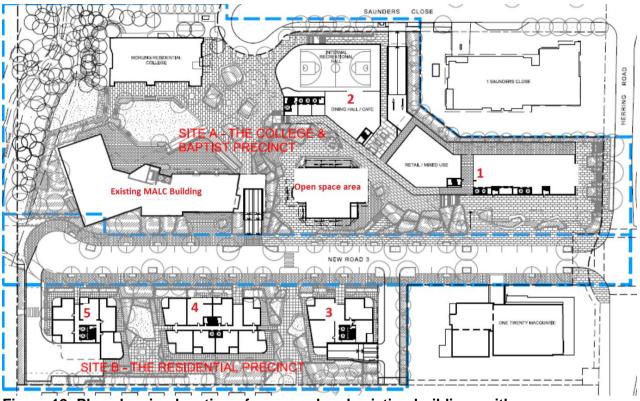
Plan showing location of proposed and existing buildings with open space throughout the site.
